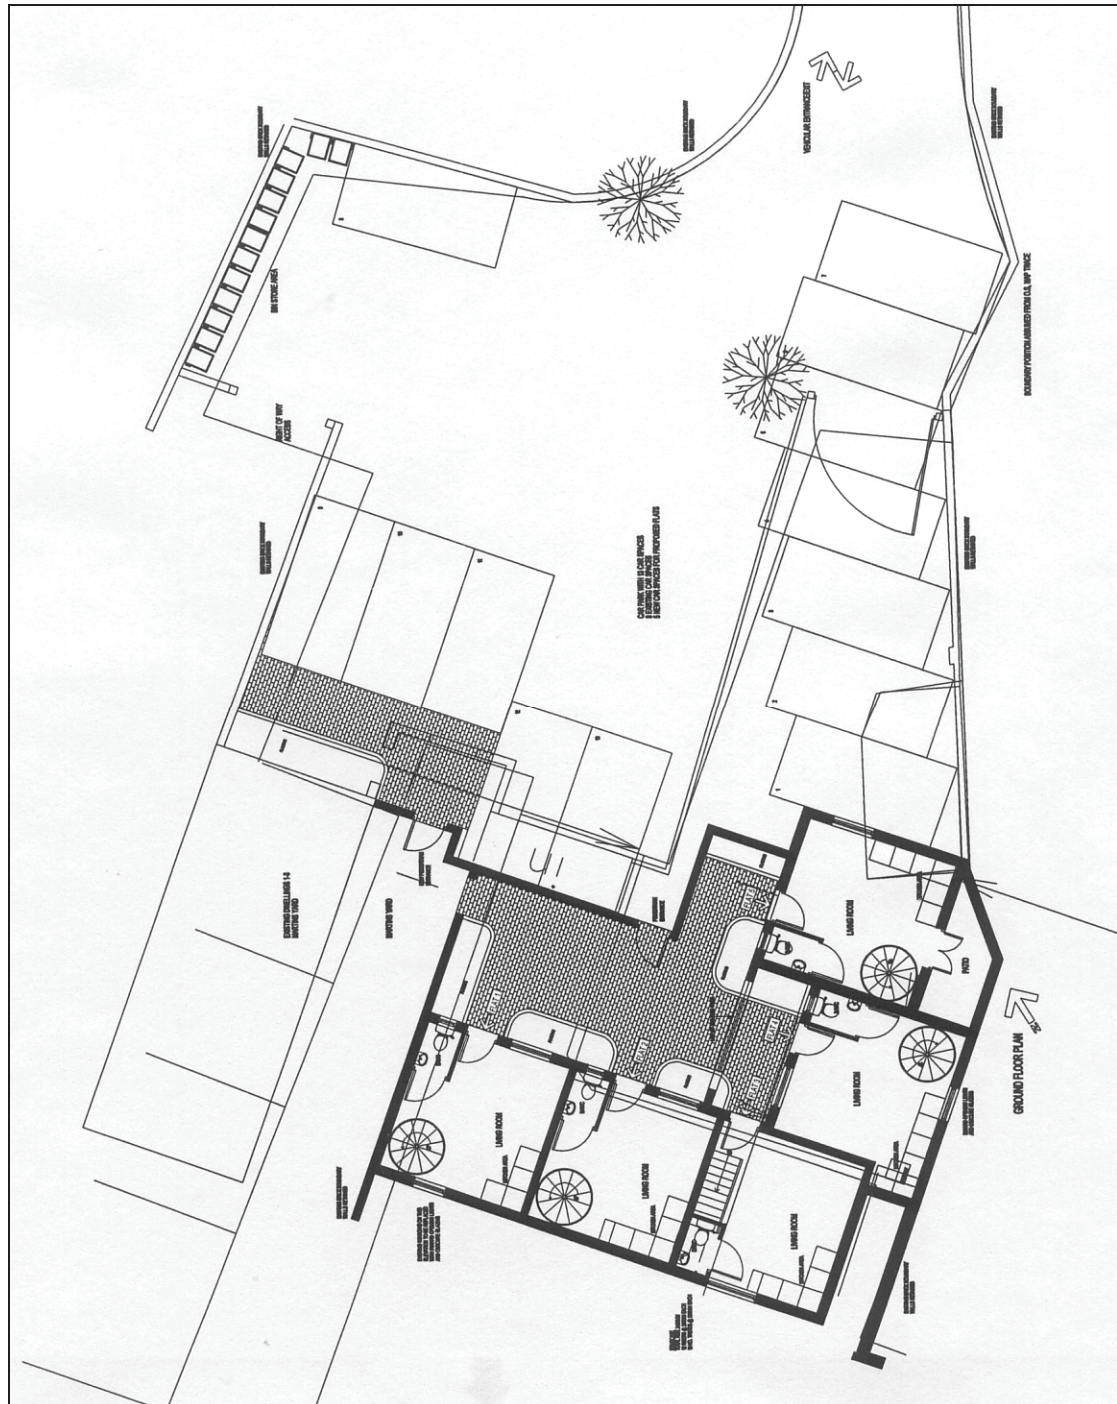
Ground floor plan of proposed development. Derived from plans supplied by architect (Scale 1:200)
